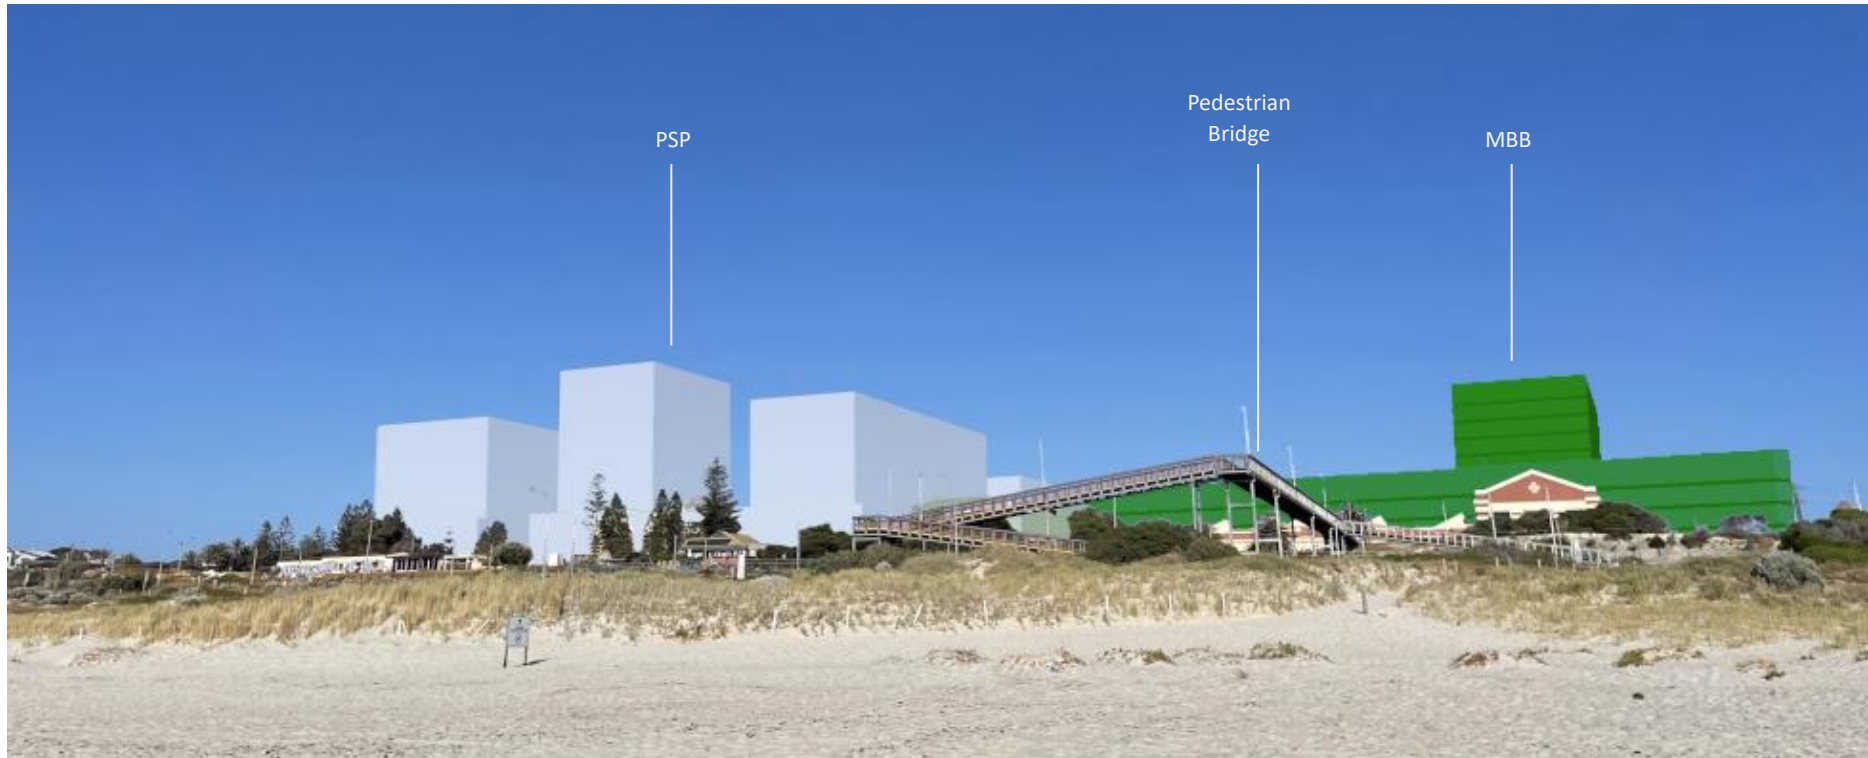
Viewpoint 17 - View from Leighton Beach near pedestrian bridge
